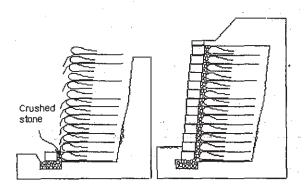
Concept of separation-type reinforced earth wall (Kim et al., 2001)
